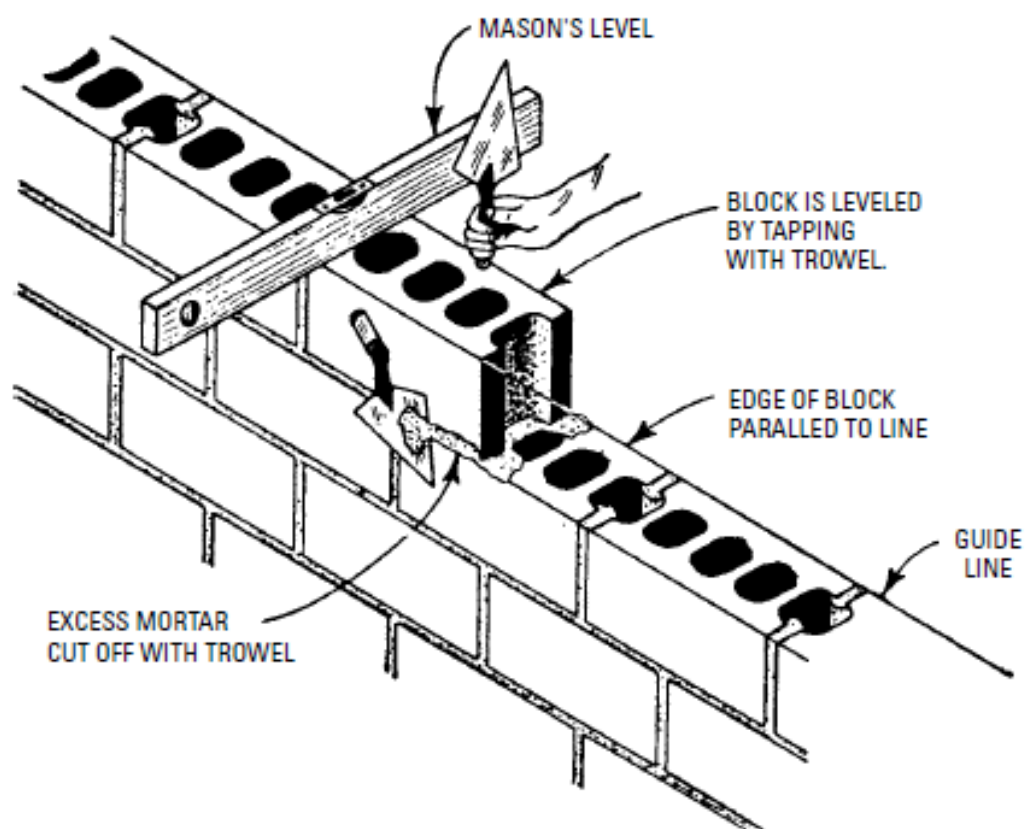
A method of laying concrete blocks. Good workmanship requires straight courses with the face of the wall plumb and true.
